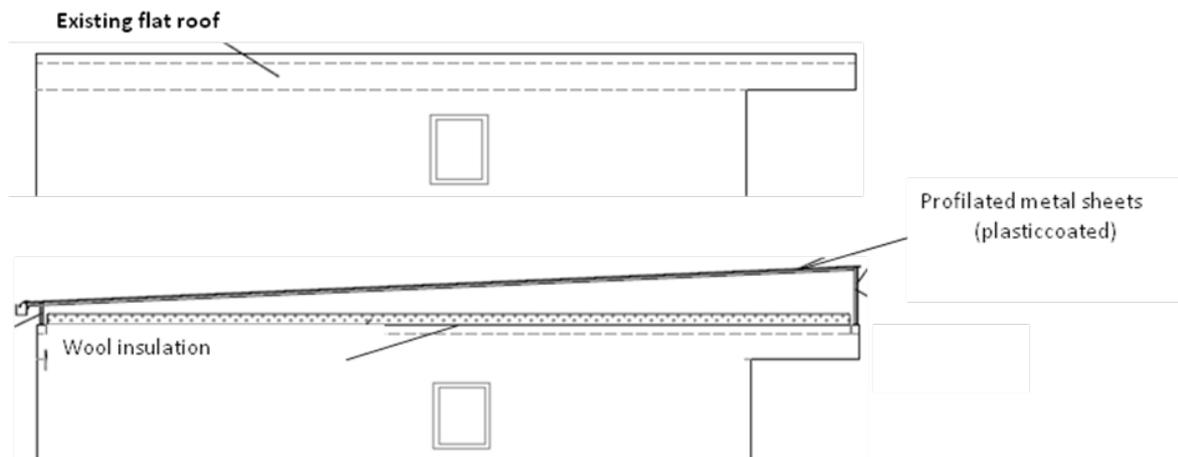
Sketch of added waterproof bearing structure with ventilated cavity underneath
